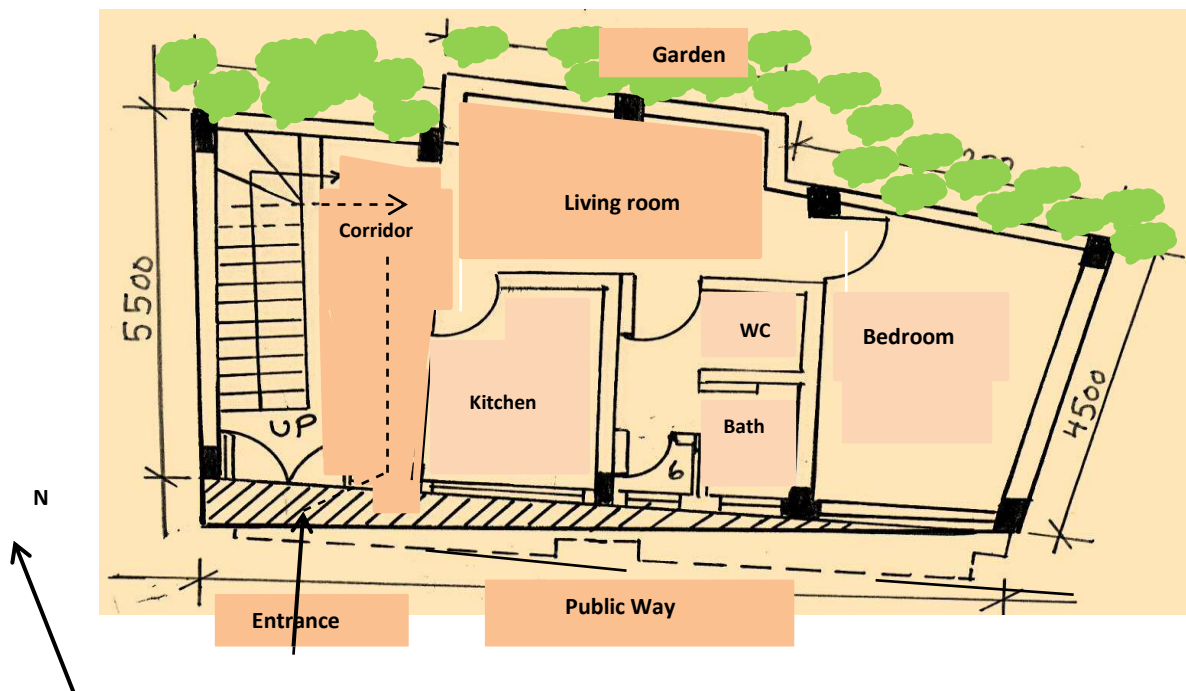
Ground floor level plan of the modern house No. 5. Scale: 1:100
